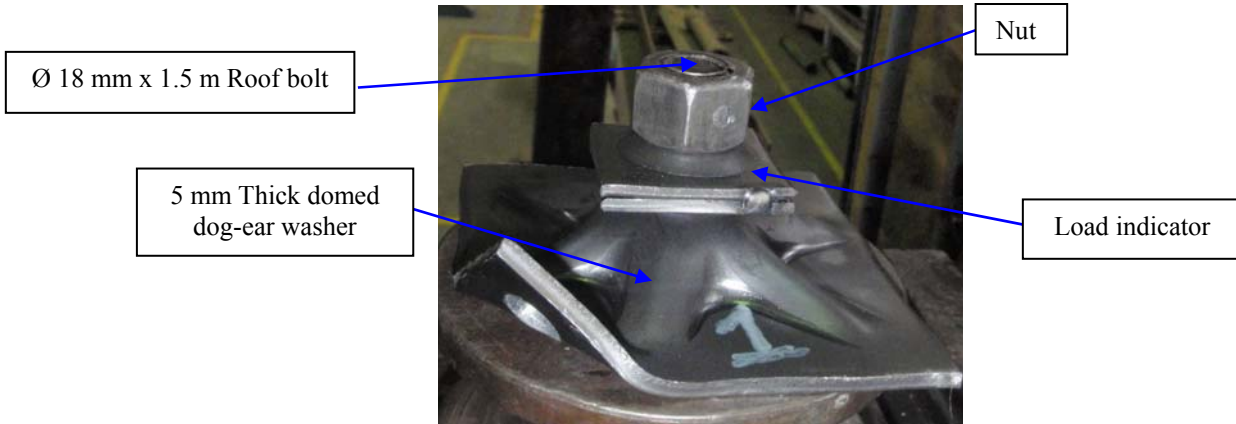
Y18 x 1.5 m Long Roof bolt assembly installed in the testing machine.
